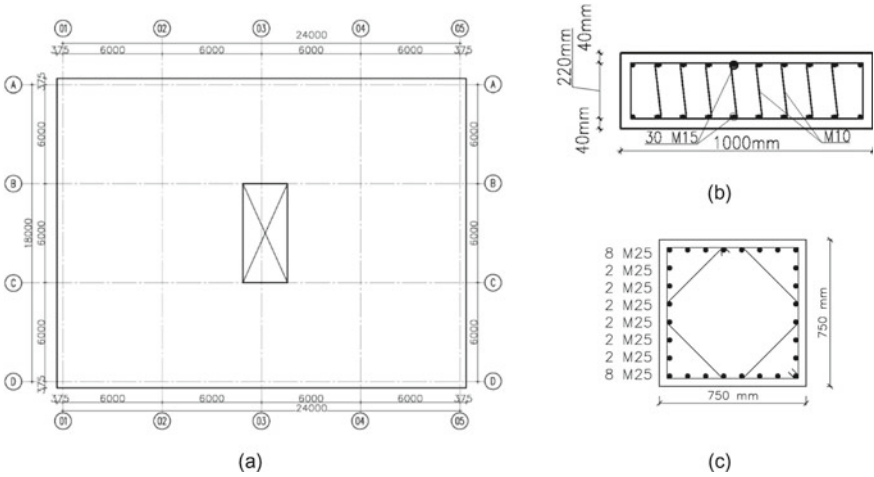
a Benchmark plan layout, concrete dimensions, and reinforcement detailing for cross-sections of b Shear wall segment and c Column
